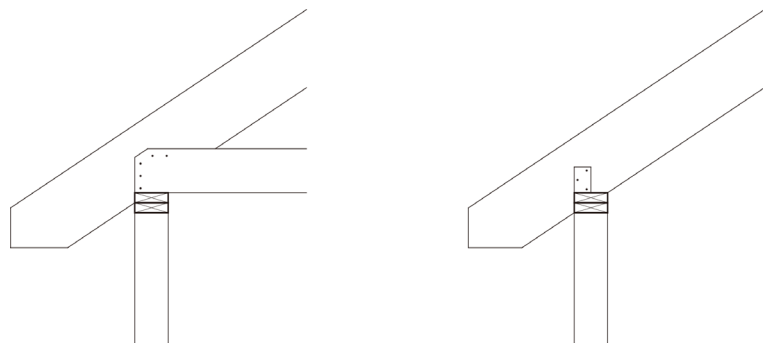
Cross section of eave attachment, drawn by author (Ching, 2014)
